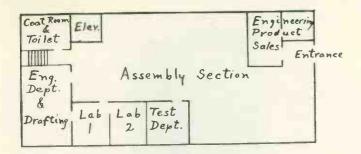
Layout of 2nd Floor Engineering Products Bldg. #17 Montreal
